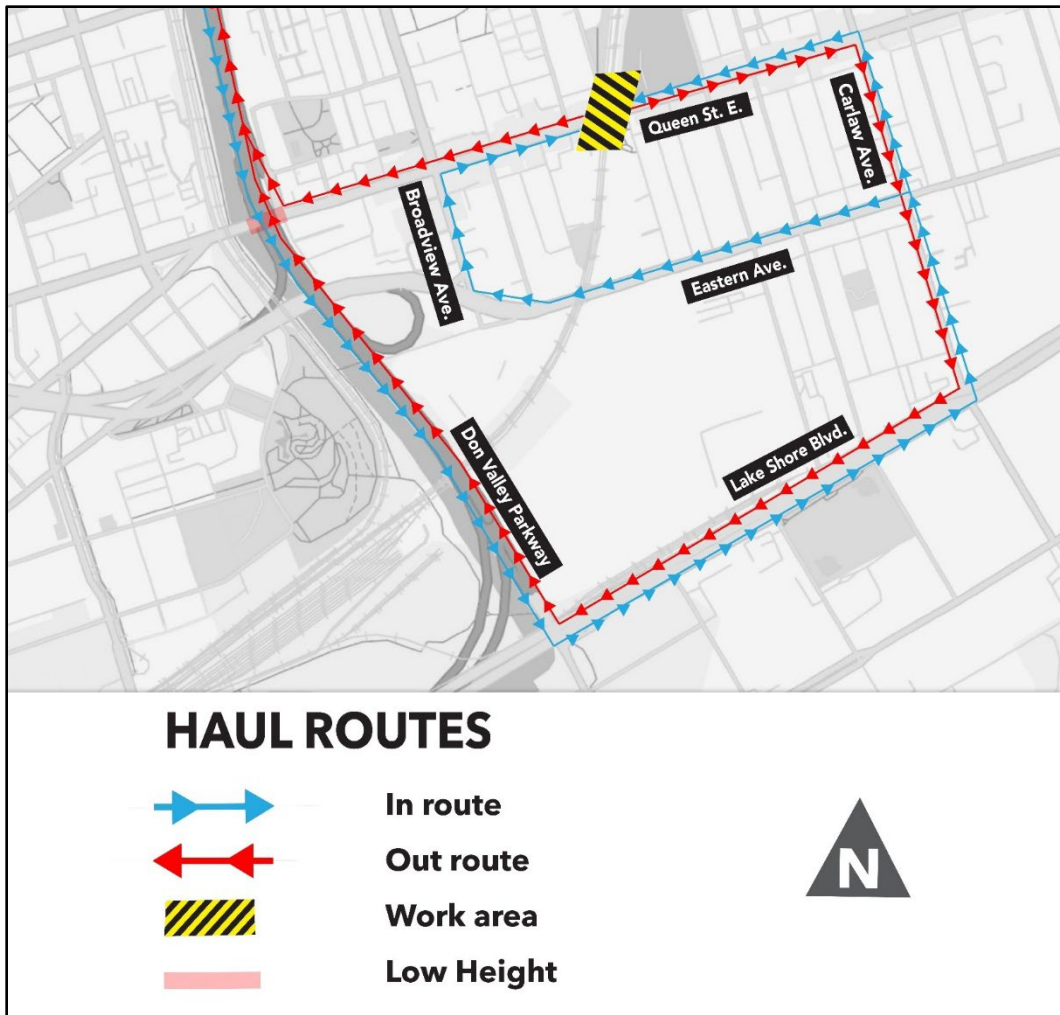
Ontario Line Leslieville Station – Proposed Haul Routes
